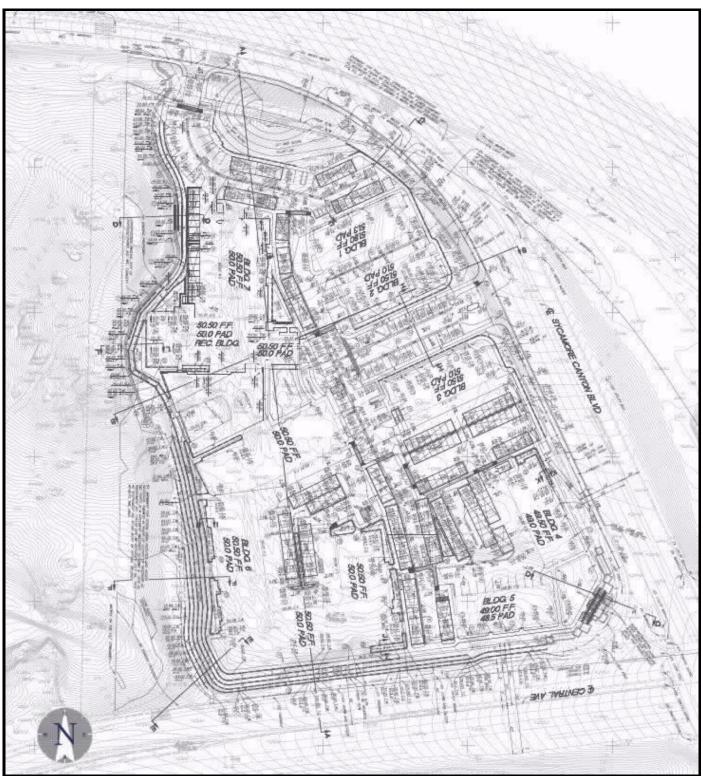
Conceptual Grading Plan (source: SDH 2020)
